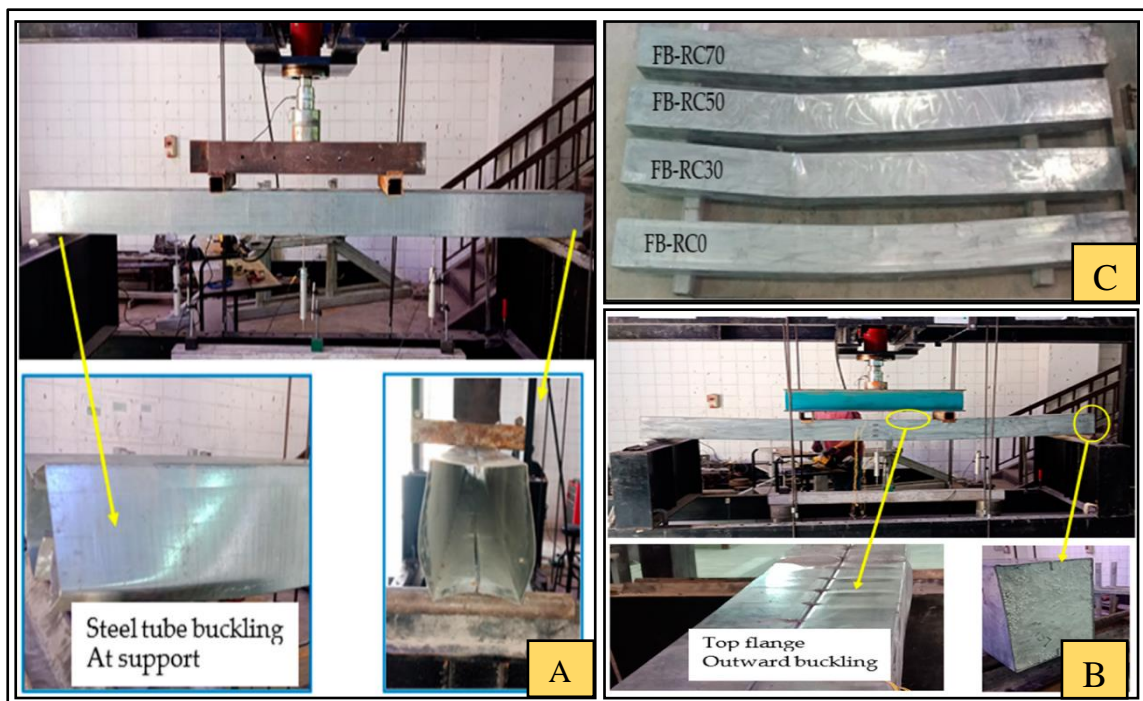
Typical Failure Modes:(a) unfilled specimen (HB); (b) filled specimen (FB-RC30); (c) all filled specimens after testing (Al Zand et al., 2021).
